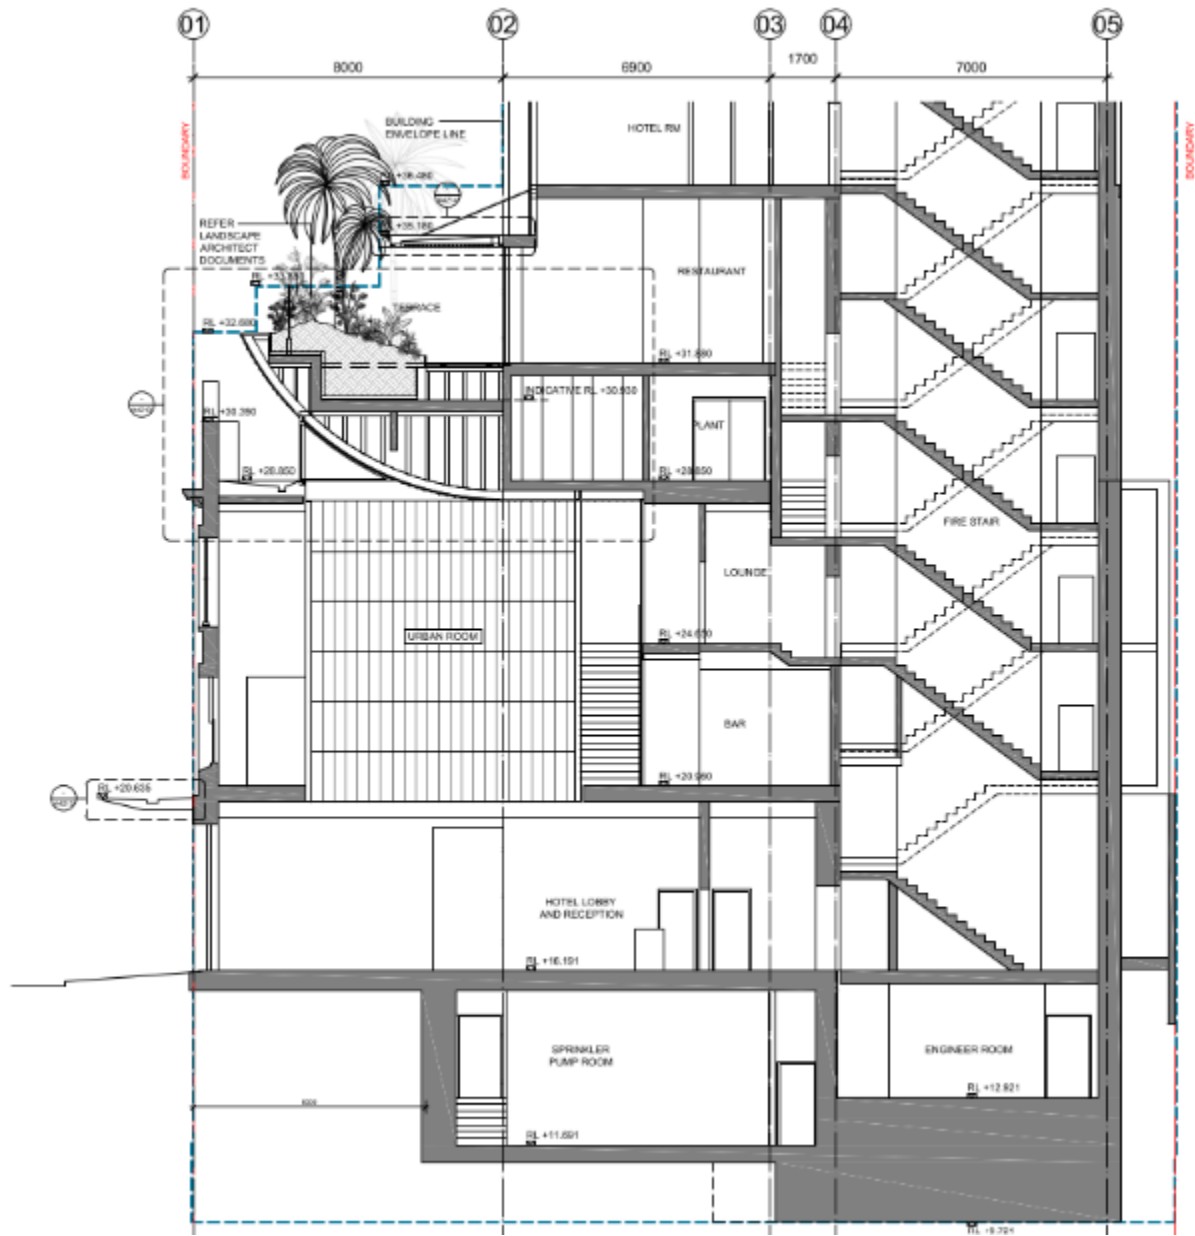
Proposed "urban room" depicted in section for D/2024/446
